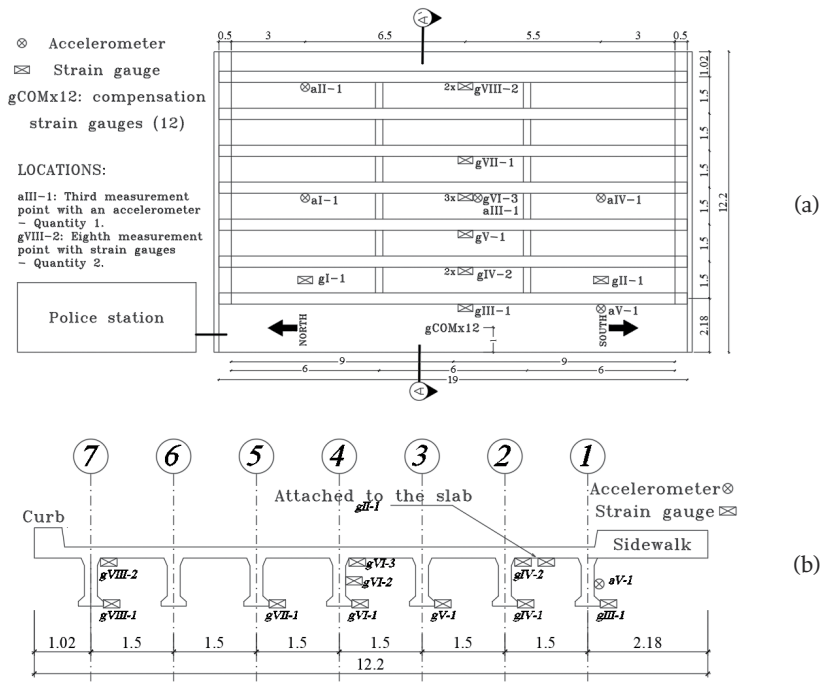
Instrumentation: (a) Plan view and (b) Elevation View (section A-A), as documented in [22].
